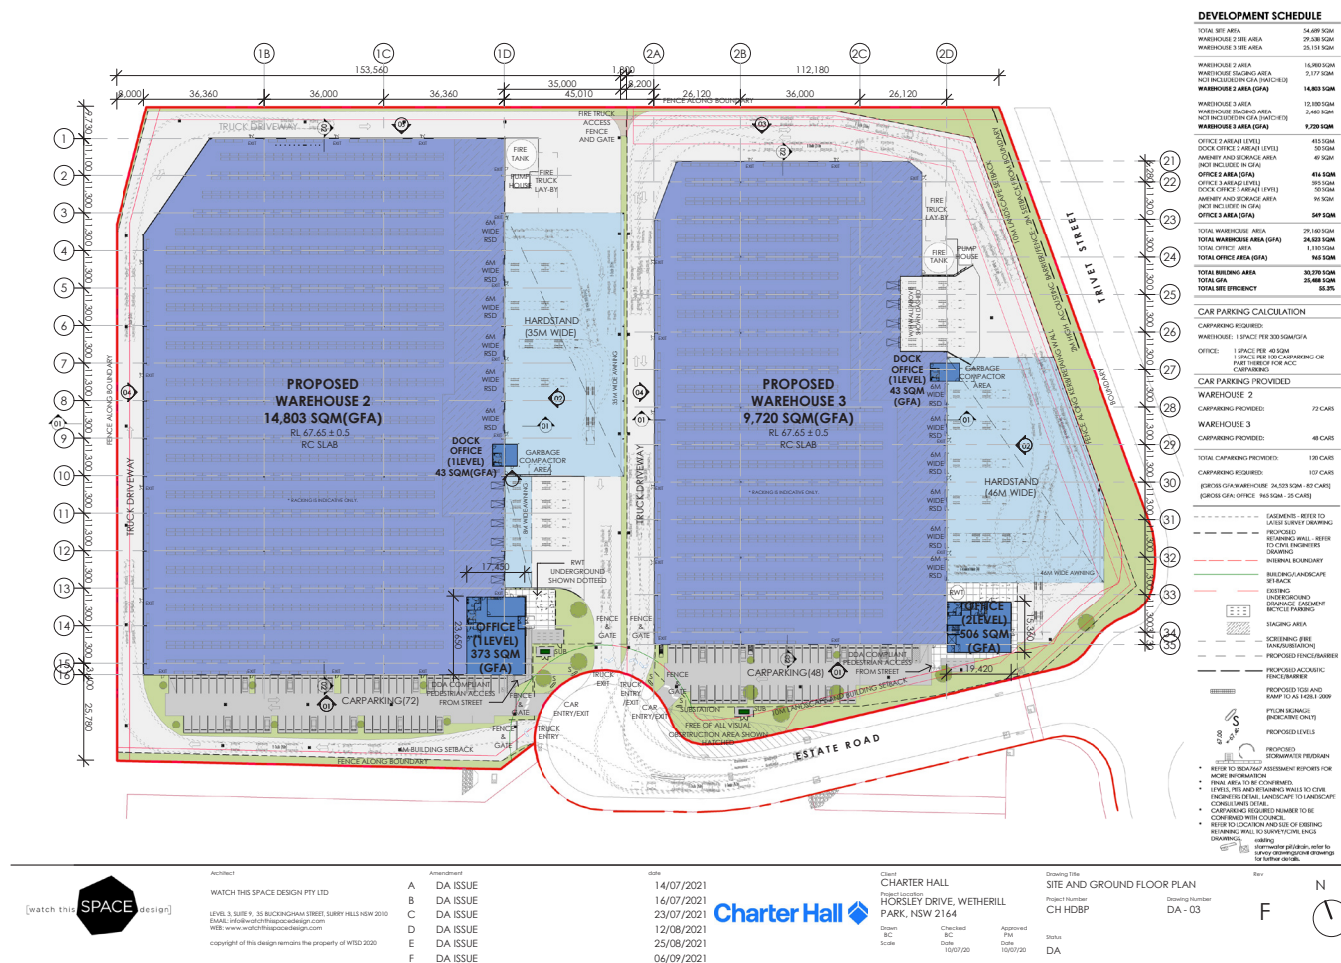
Proposed Site Plan (Source: Watch This Space Design)
